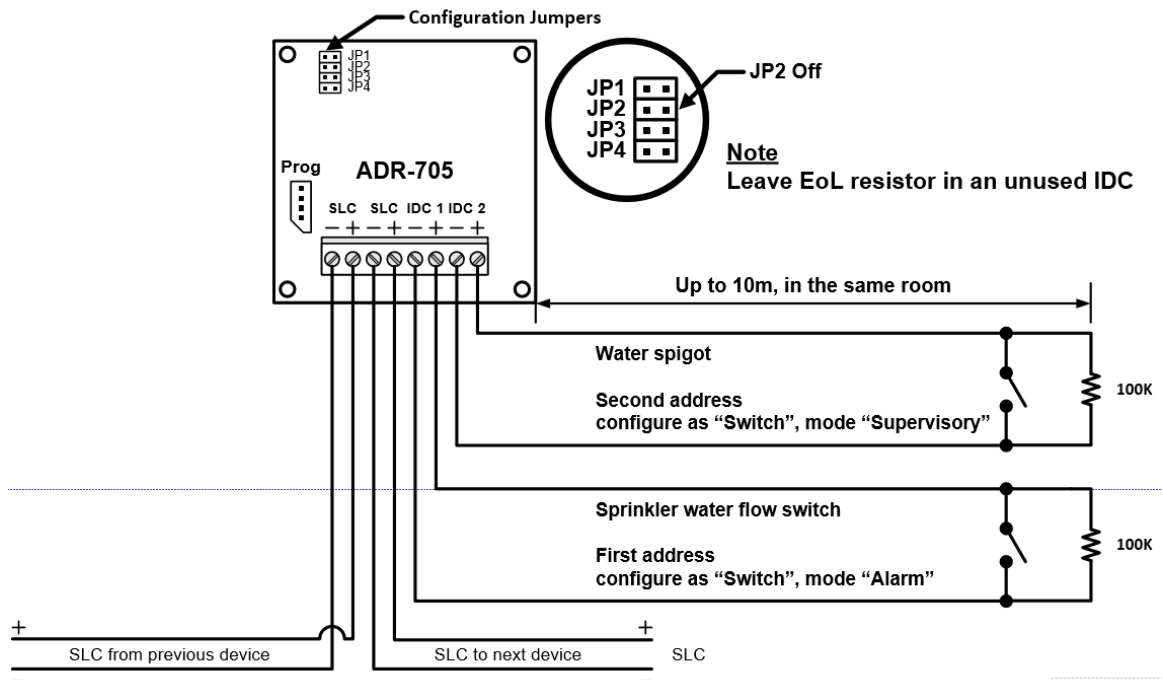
ADr-705 – connecting sprinkler water-flow switches
